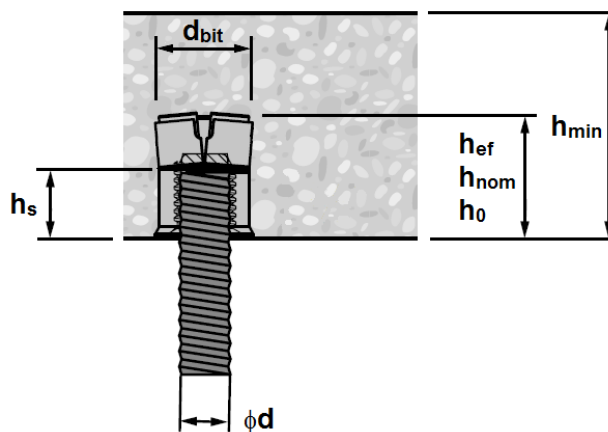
HILTI HDI-TZ INSTALLATION PARAMETERS IN CONCRETE
